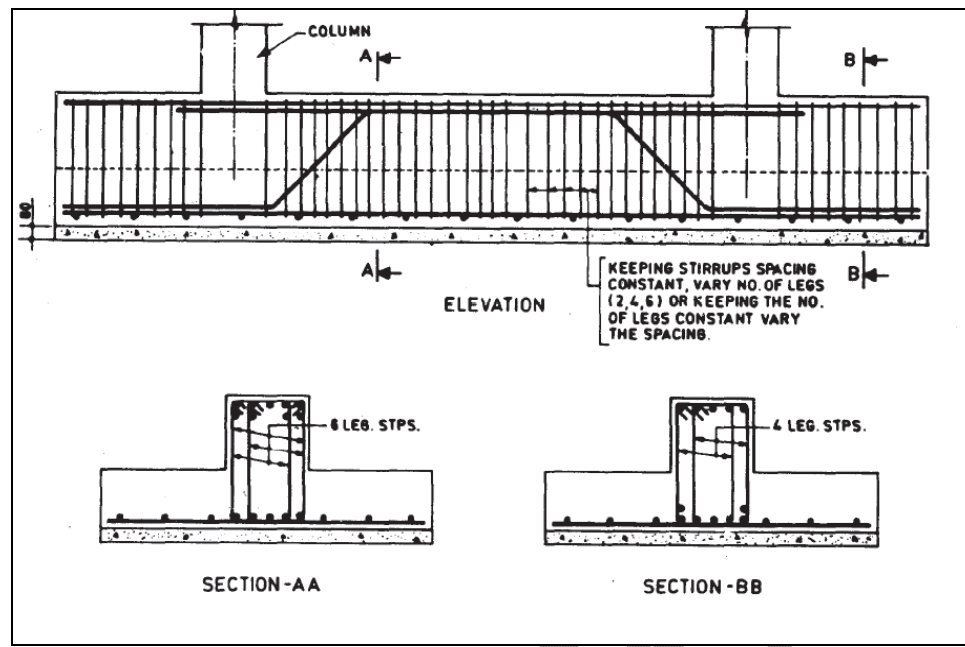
Typical detailing of a foundation beam as described in SP 34
